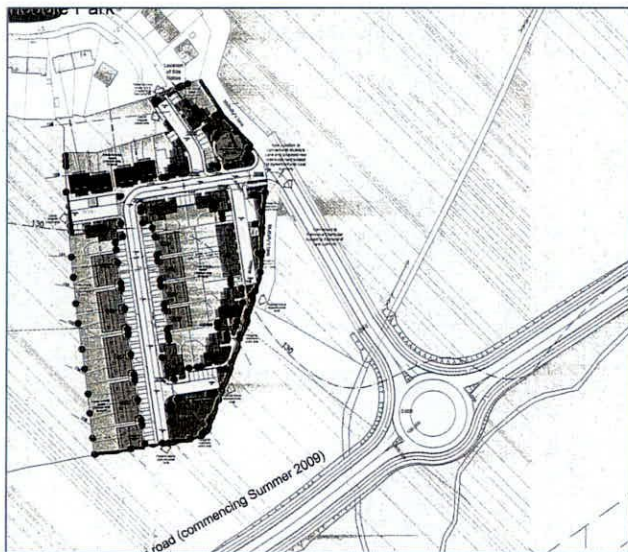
Planning Ref:SD08A/0858, Proposed Access Arrangements & Distributor Road
